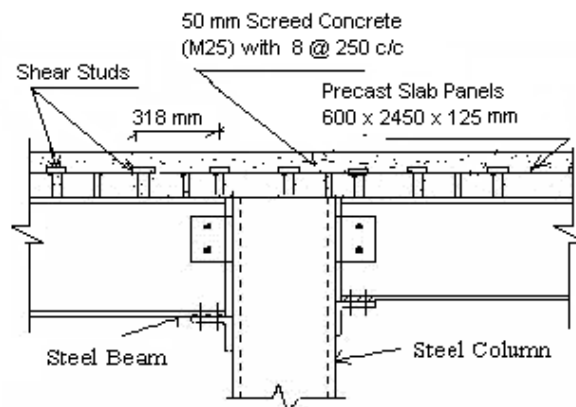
Section of Steel Frame Beam and Slab Panel with Precast Concrete Floor
